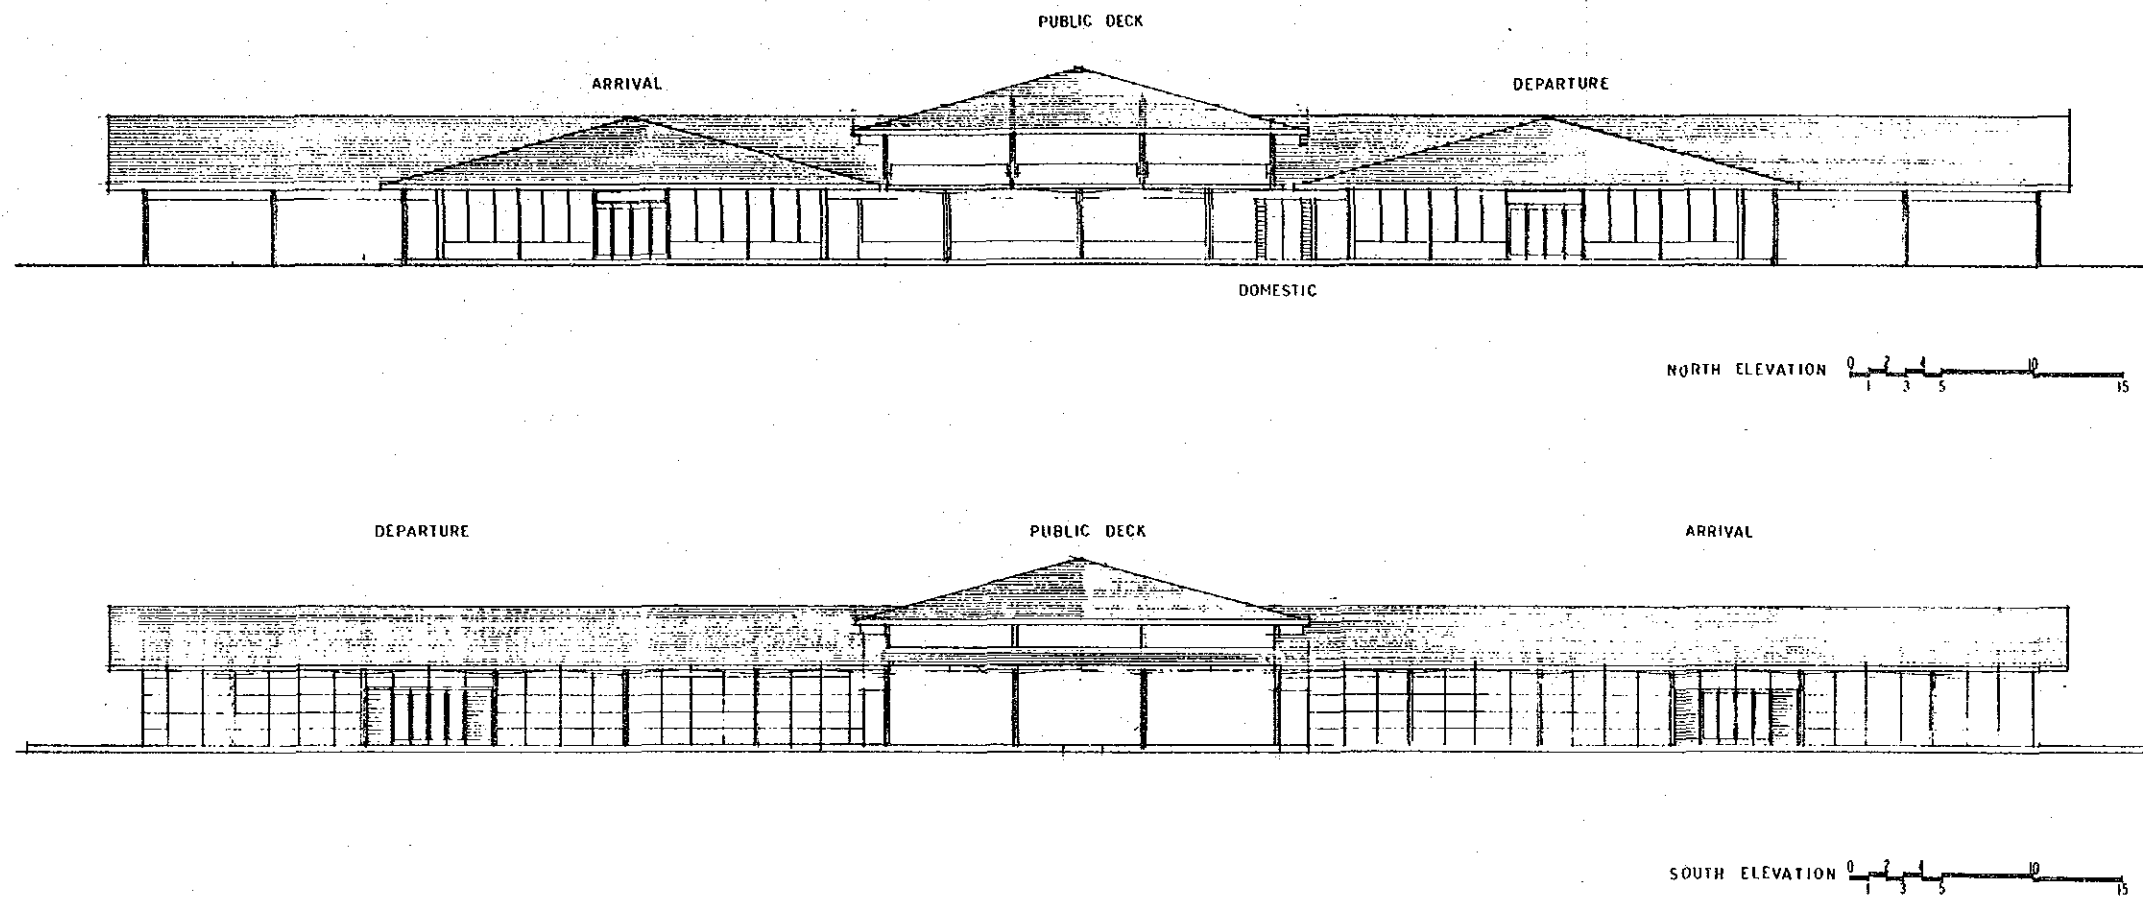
Passenger Terminal Building (Elevations)
